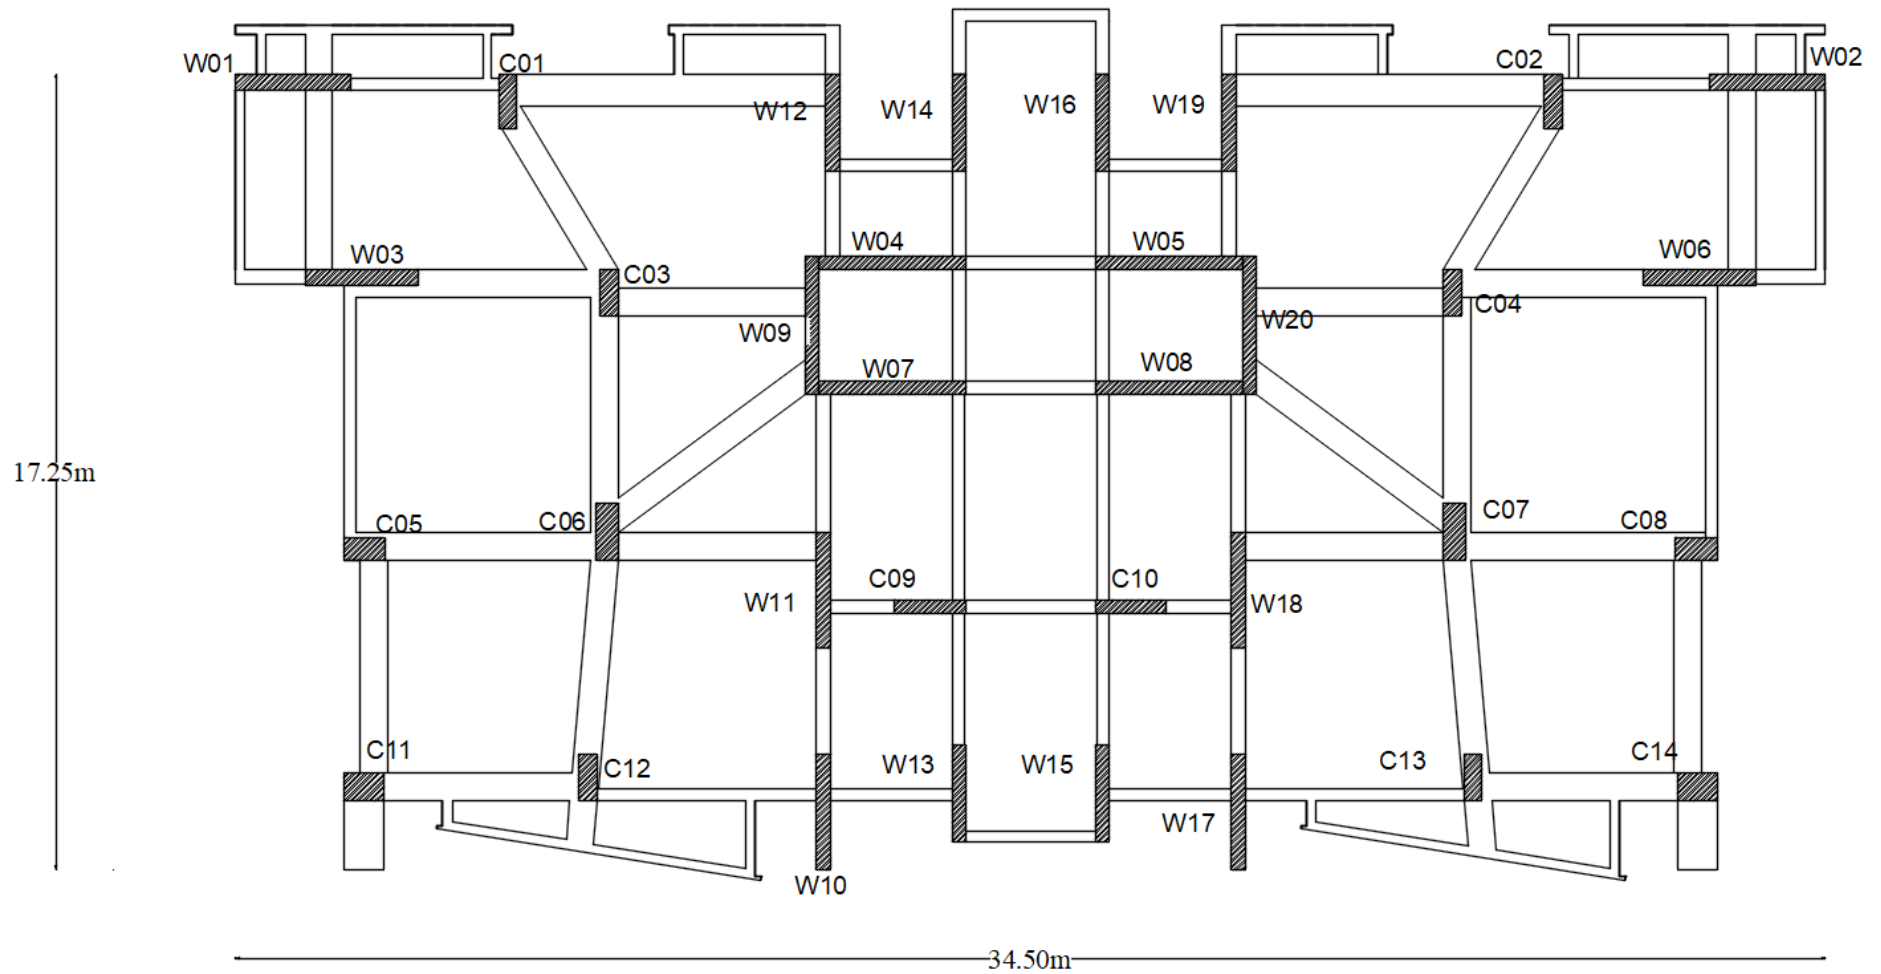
Distribution of columns and shear walls in the ground and typical floor of the building.
